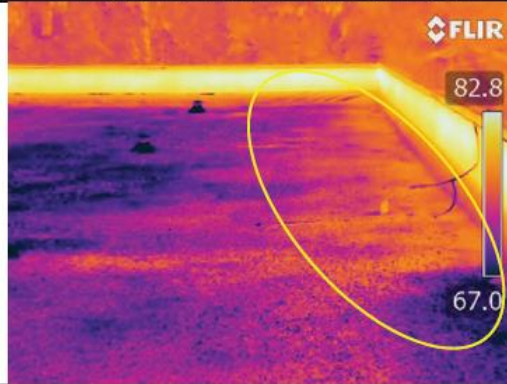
IR image of center transition of the roof north of the courtyard. This image is looking north along the east parapet.
